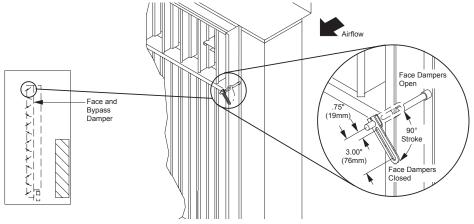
Face and Bypass Dampers, Staggered Arrangement—RAH 047C–077C Only
